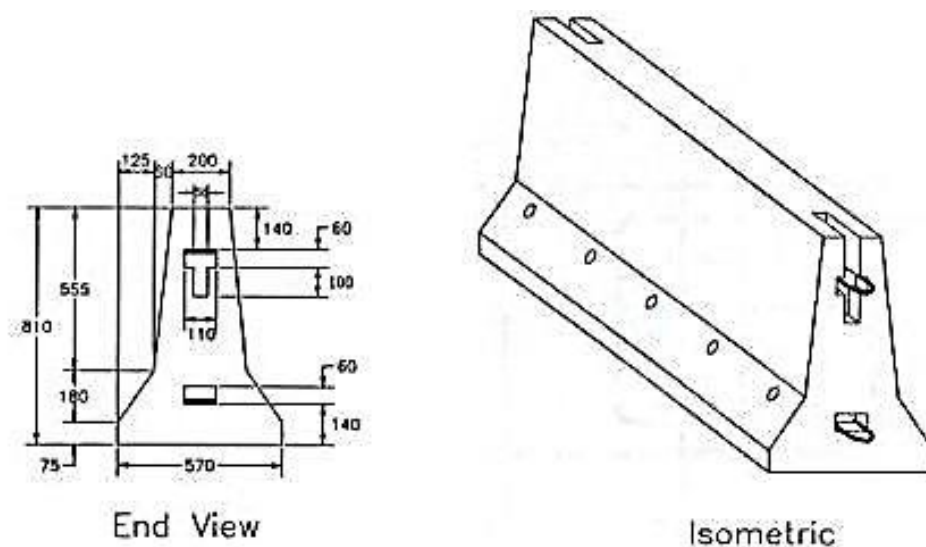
Initial Prototype for F-Shape PCB Segment (ITMP-1) [8]
